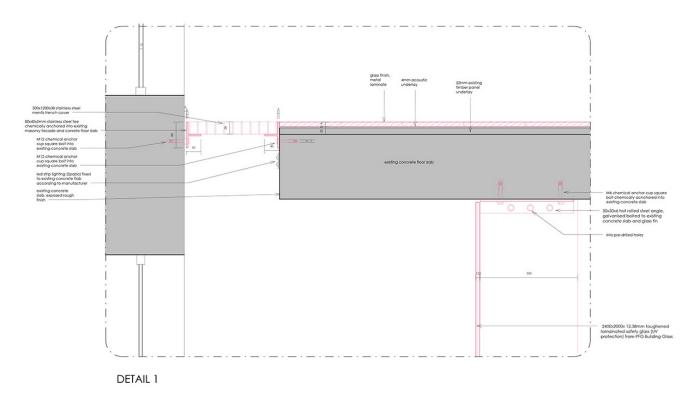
Detail of new connection between the first floor and facade- not to scale (Author 2013)
